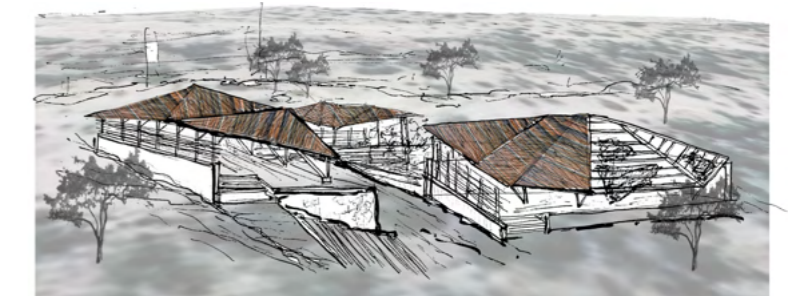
Himba pavilion Proposal 1 (Author, 2021)
